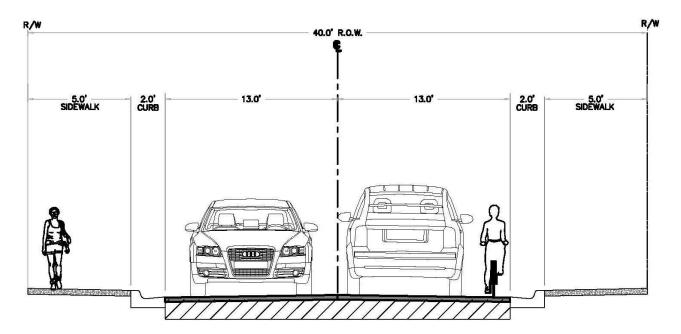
Proposed Conceptual Typical Section, 40' Right-of-way - Sharrows
